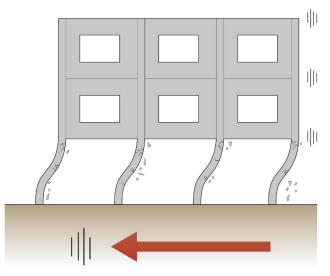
The columns in a soft story bend excessively and suffer serious damage.
